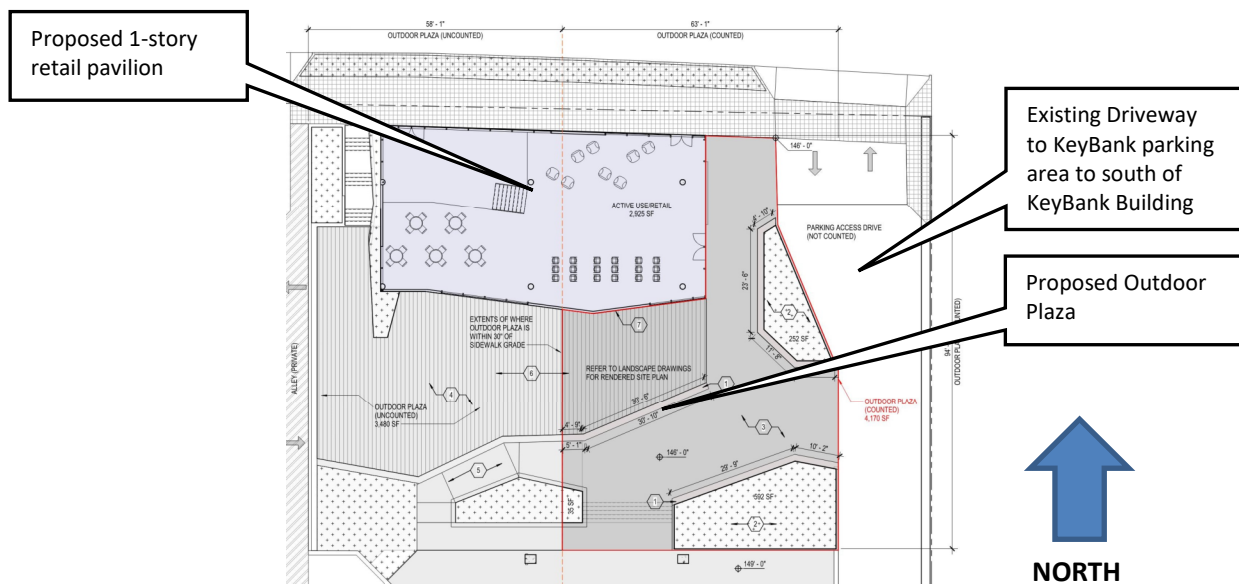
MDP Phase 1/DESIGN REVIEW Site Plan
